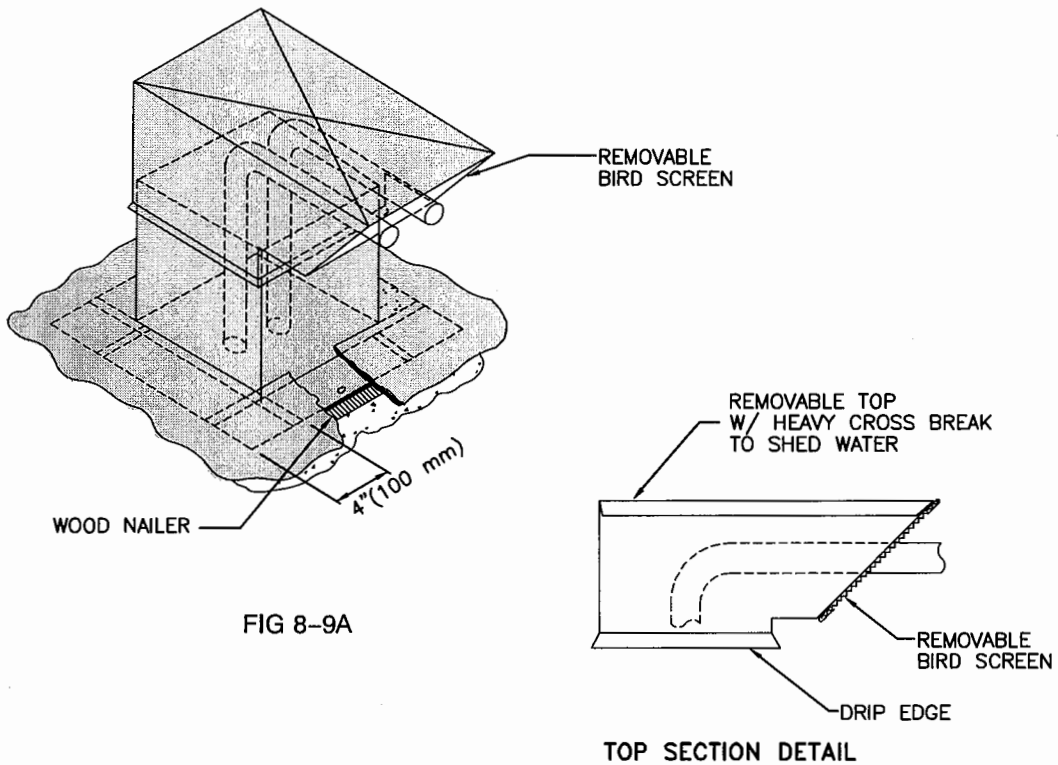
ROOF PENETRATION FLASHING — PIPES
